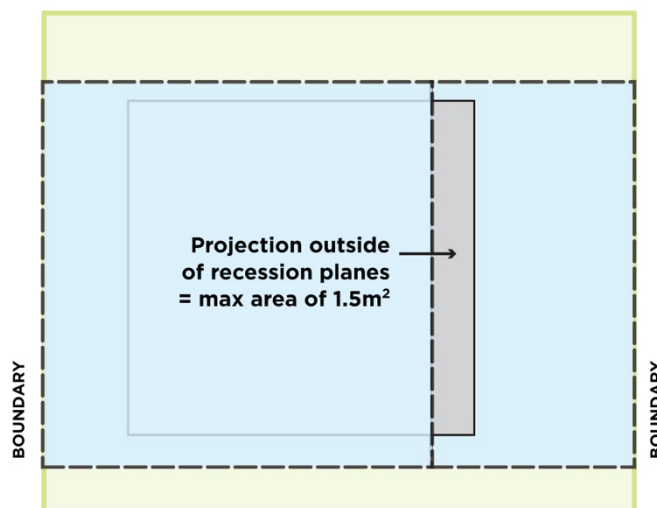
SITE PLAN view showing the area of the projection = to maximum 1.5m²
